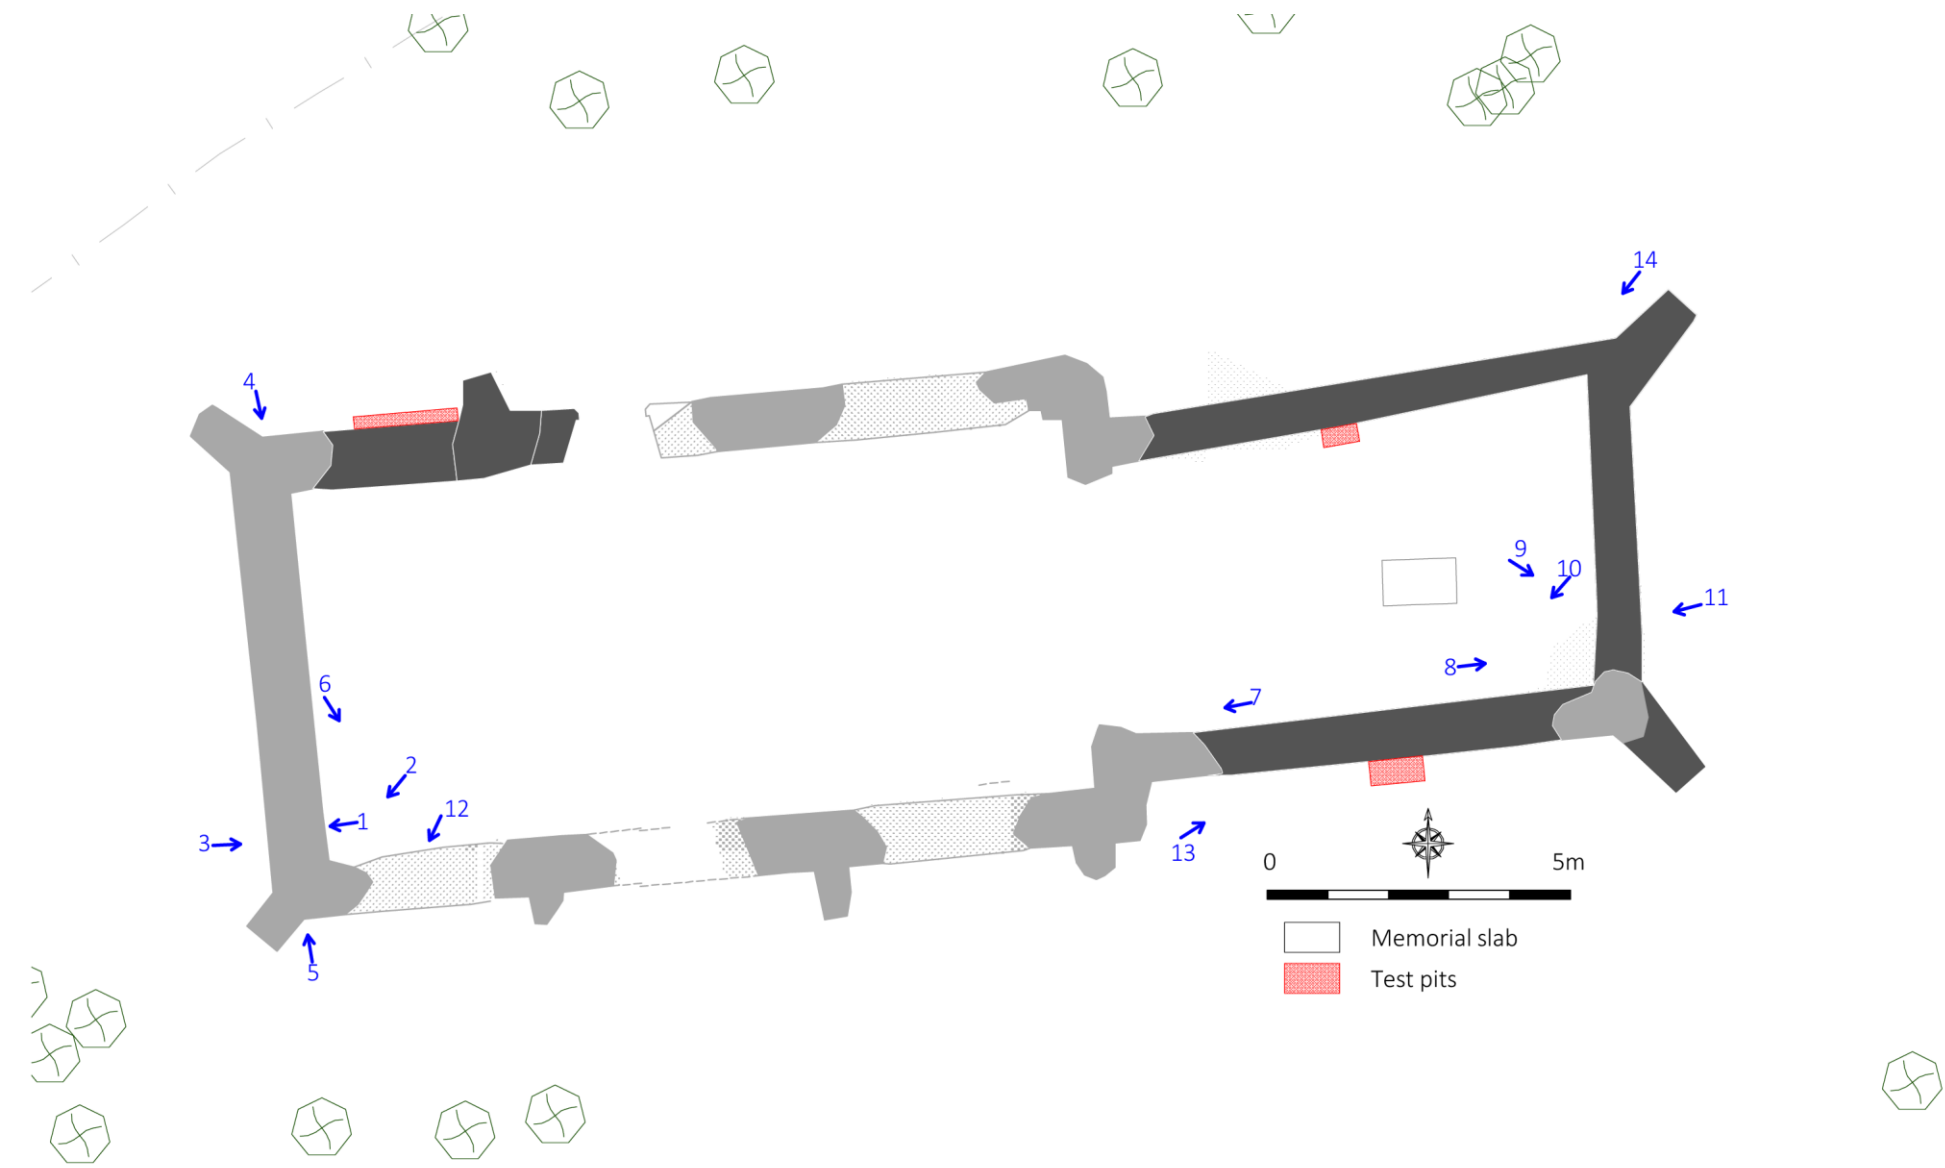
Photo plan 27<sup>th</sup> April 2022 (scale 1:125)
